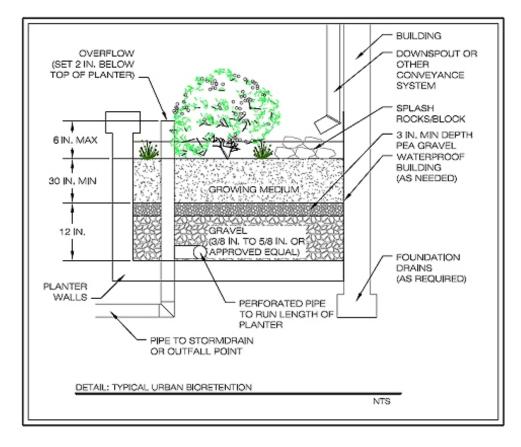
Stormwater Planter Cross-Section (source: VADCR, 2010)
